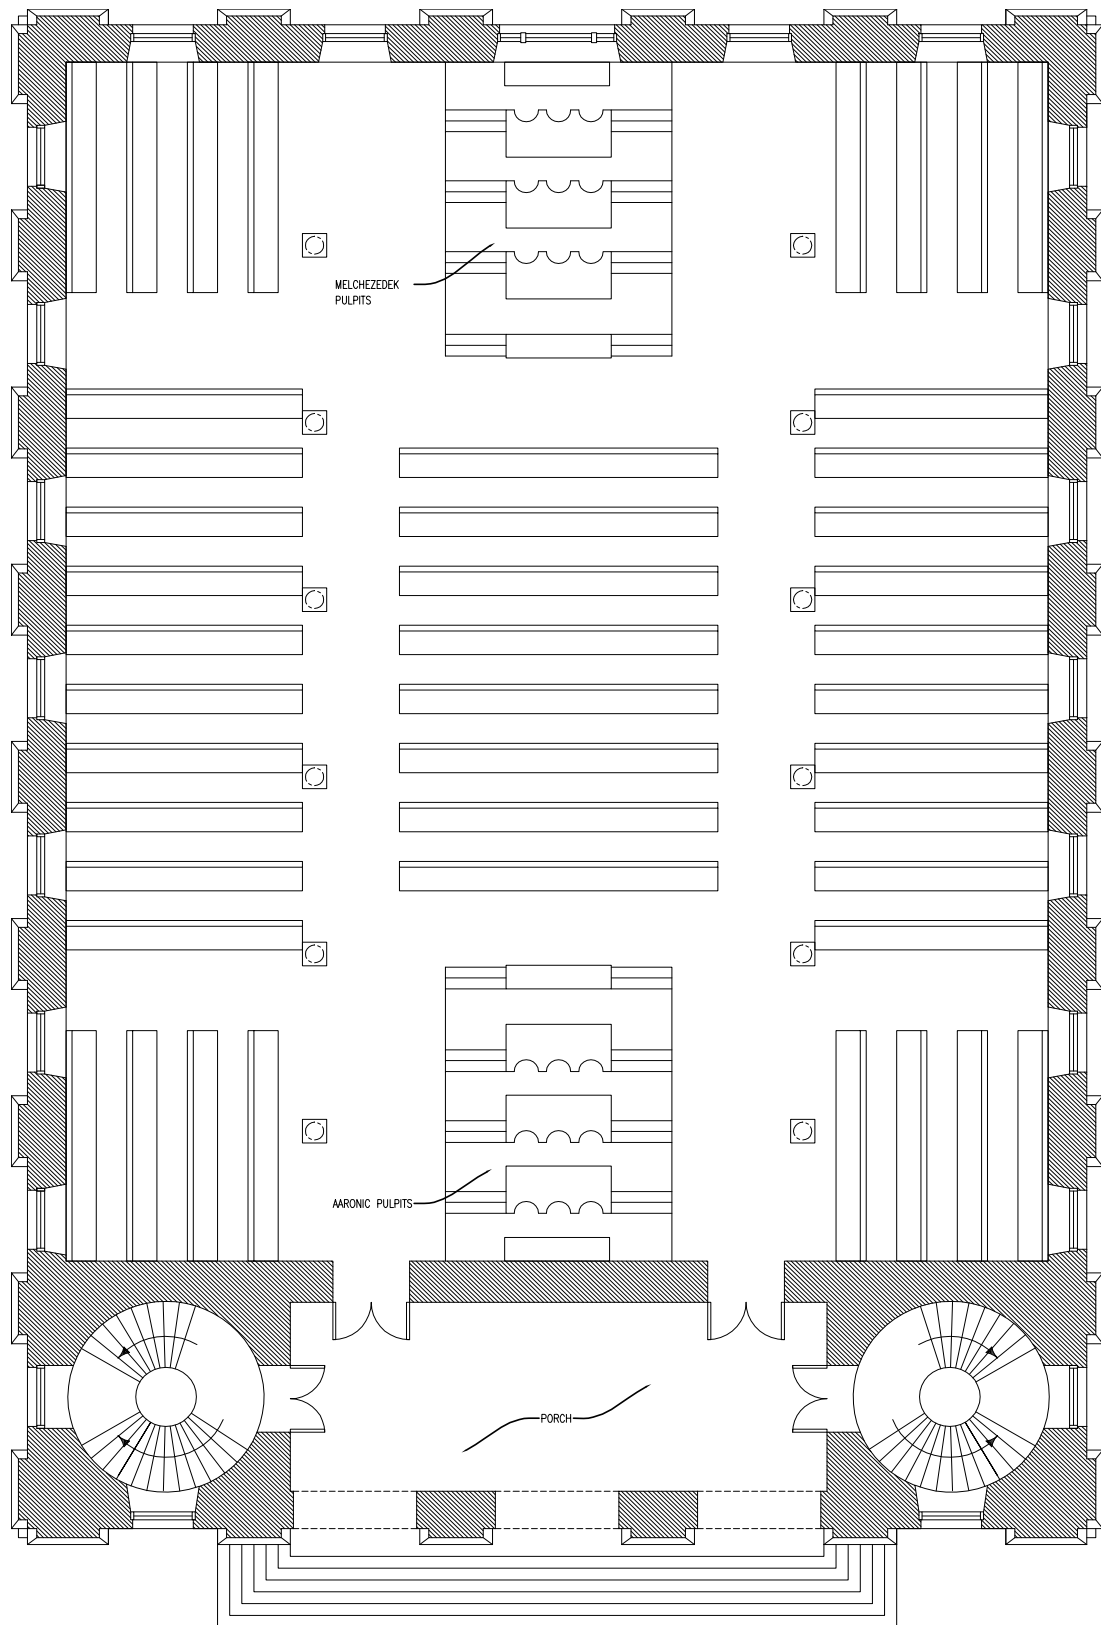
First floor plan based on Lisle Brown and FFKR Architects reconstruction drawings. Drawn by author.
